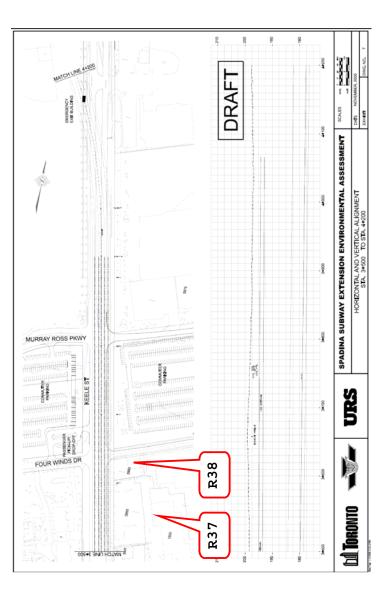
PLAN AND PROFILE OF THE PROPOSED SUBWAY ALIGNMENT
